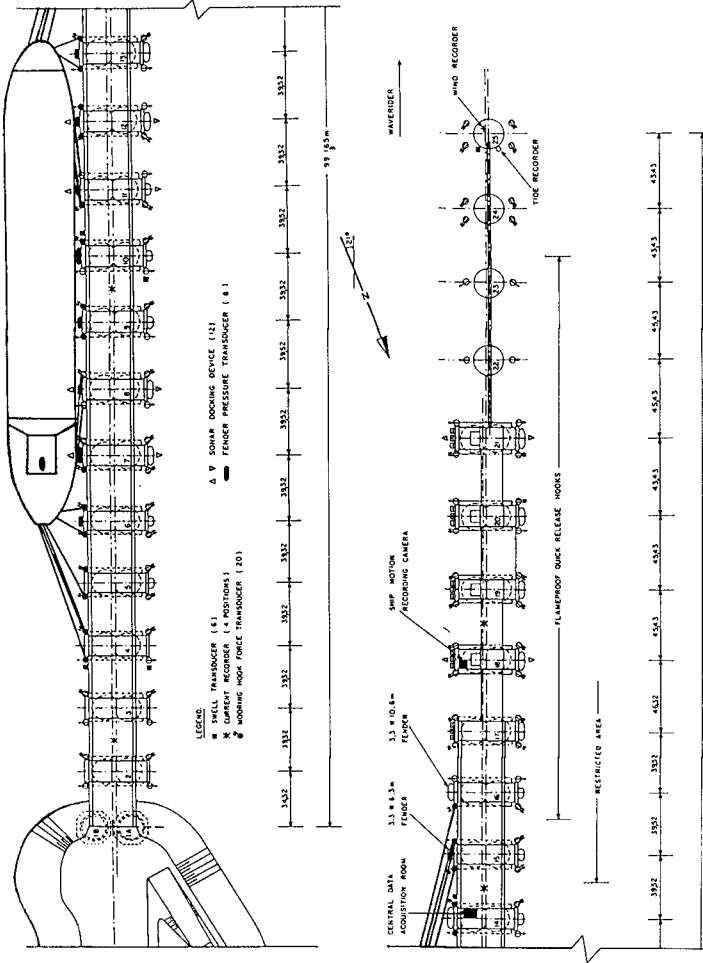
Ore jetty, position of instrumentation and typical mooring layout
